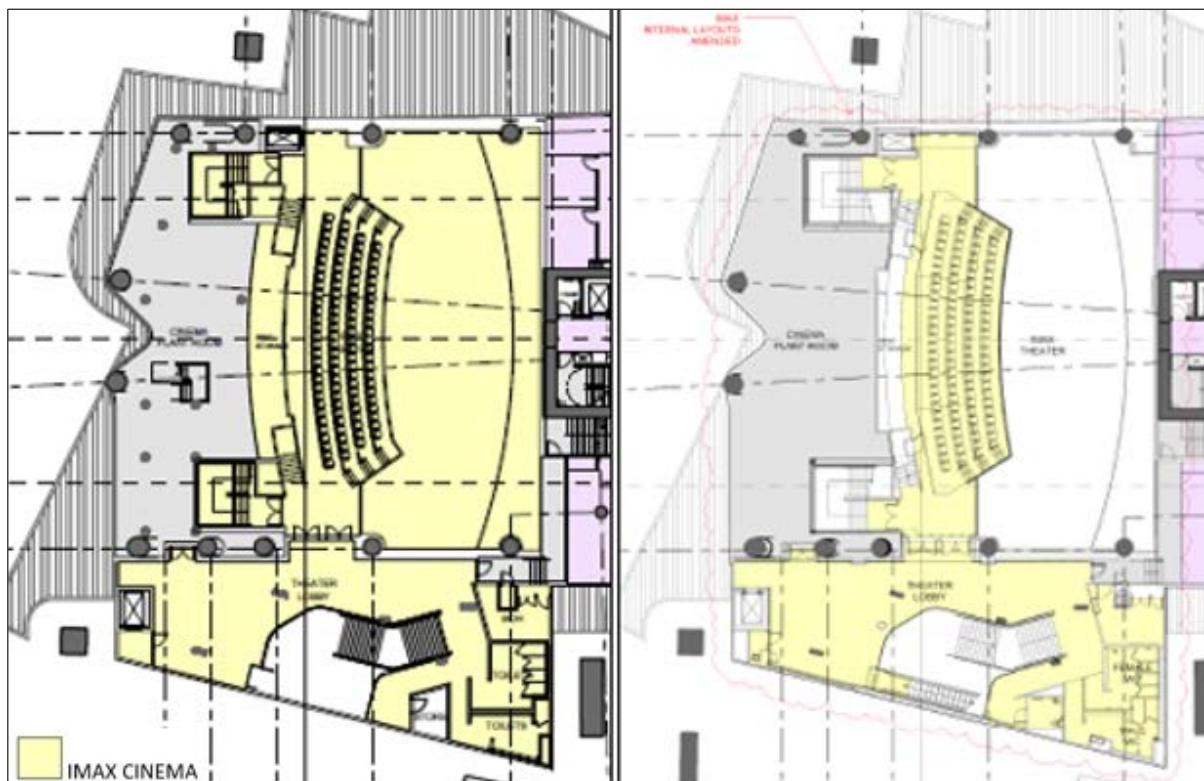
| Existing (left) and proposed (right) Level 2 layout (Source: Applicants EA)
